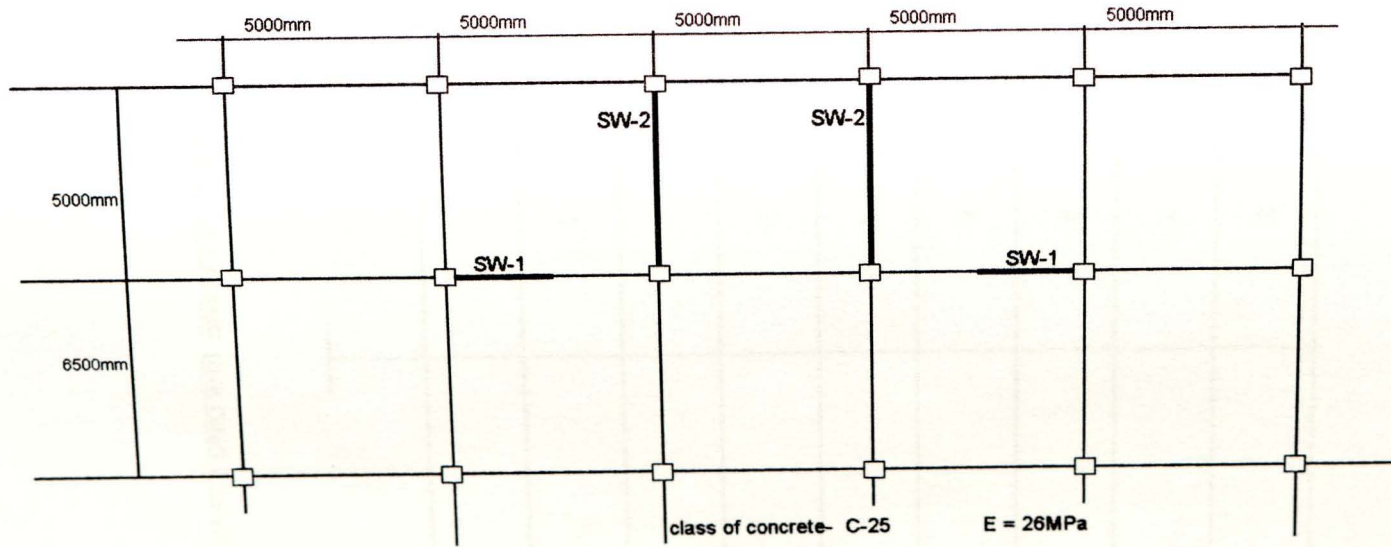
SUNSHINE BUILDING FLOOR PLAN.
